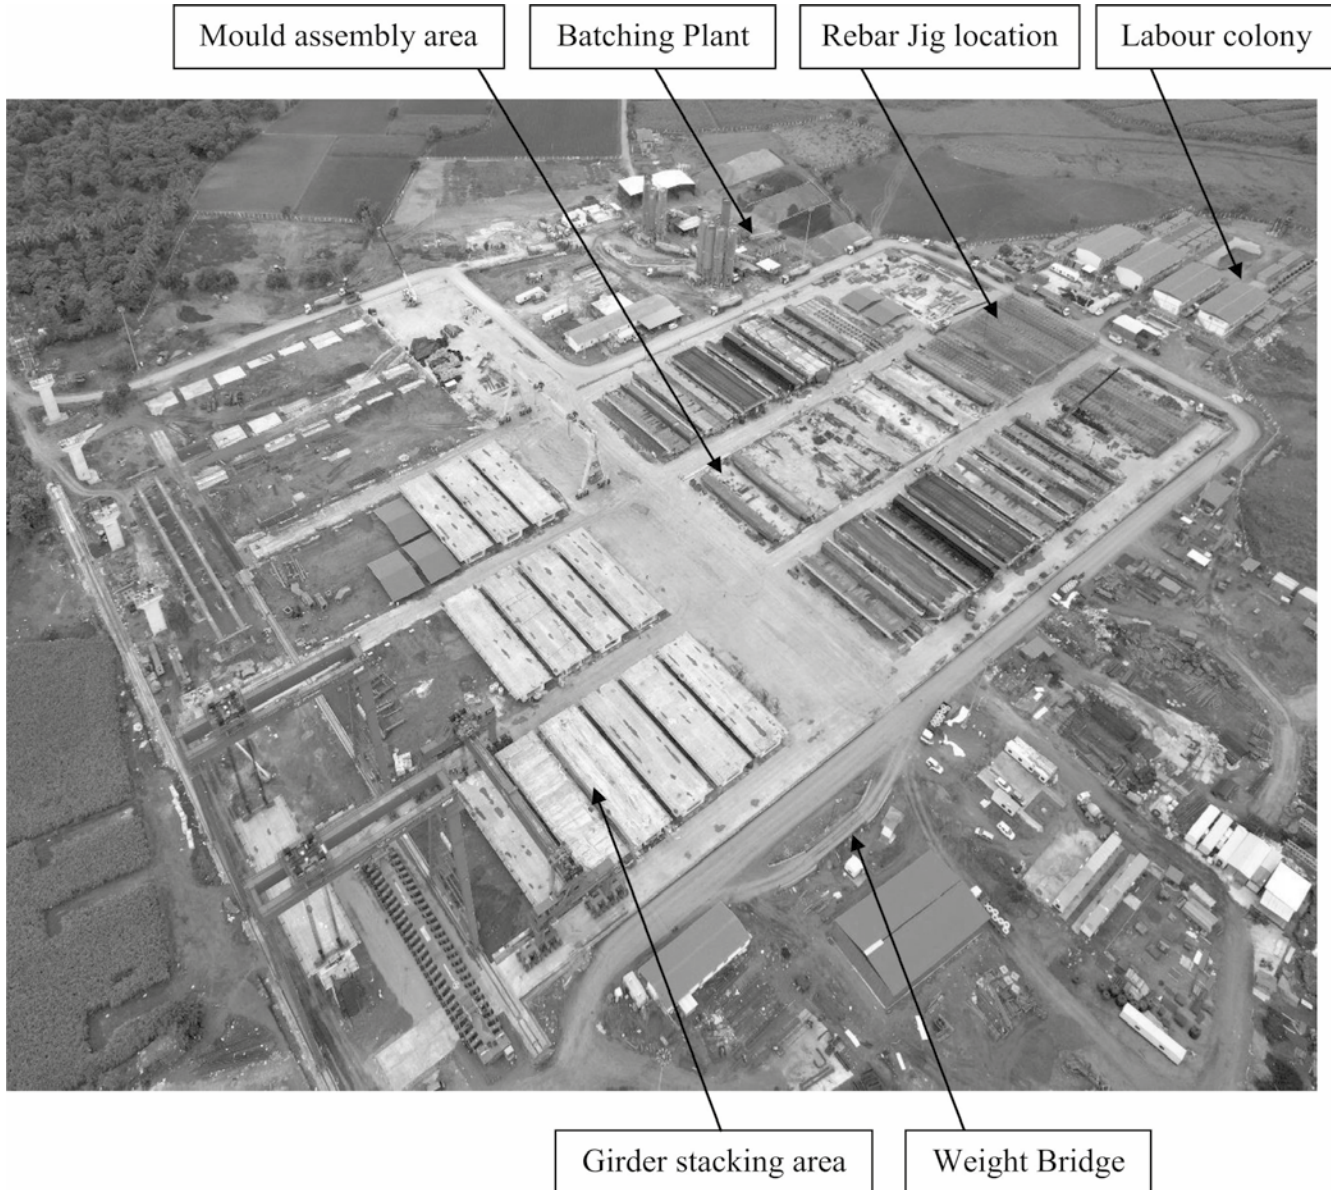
Precast Yard Layout (Source: HSR Site Photo)
